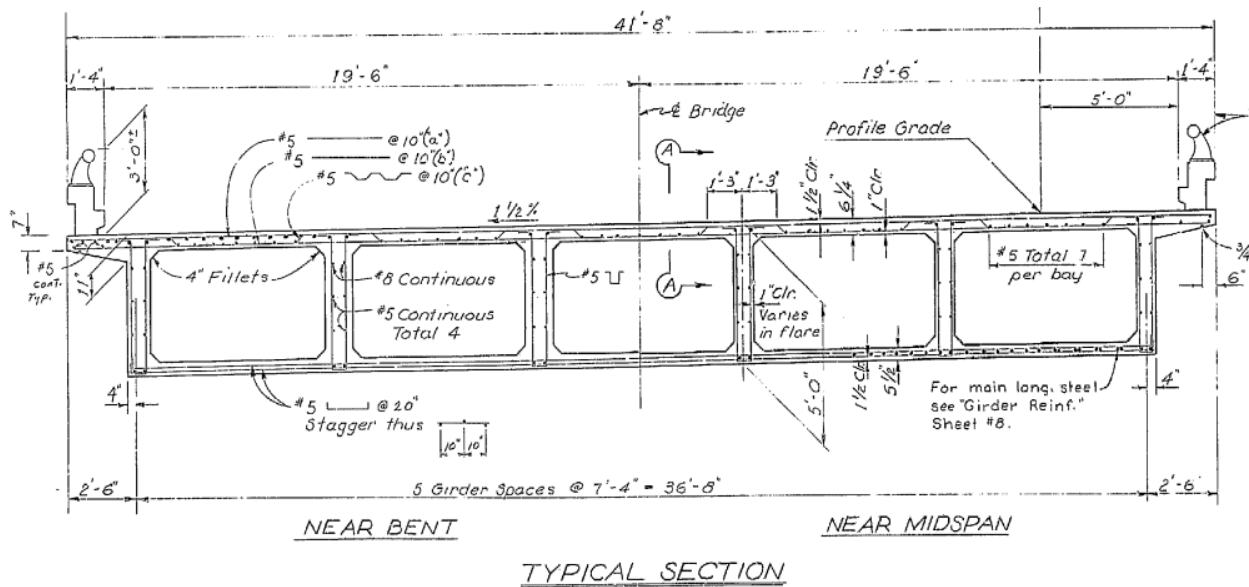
Typical section bridge 02 0036L, Inspection Report from Caltrans
